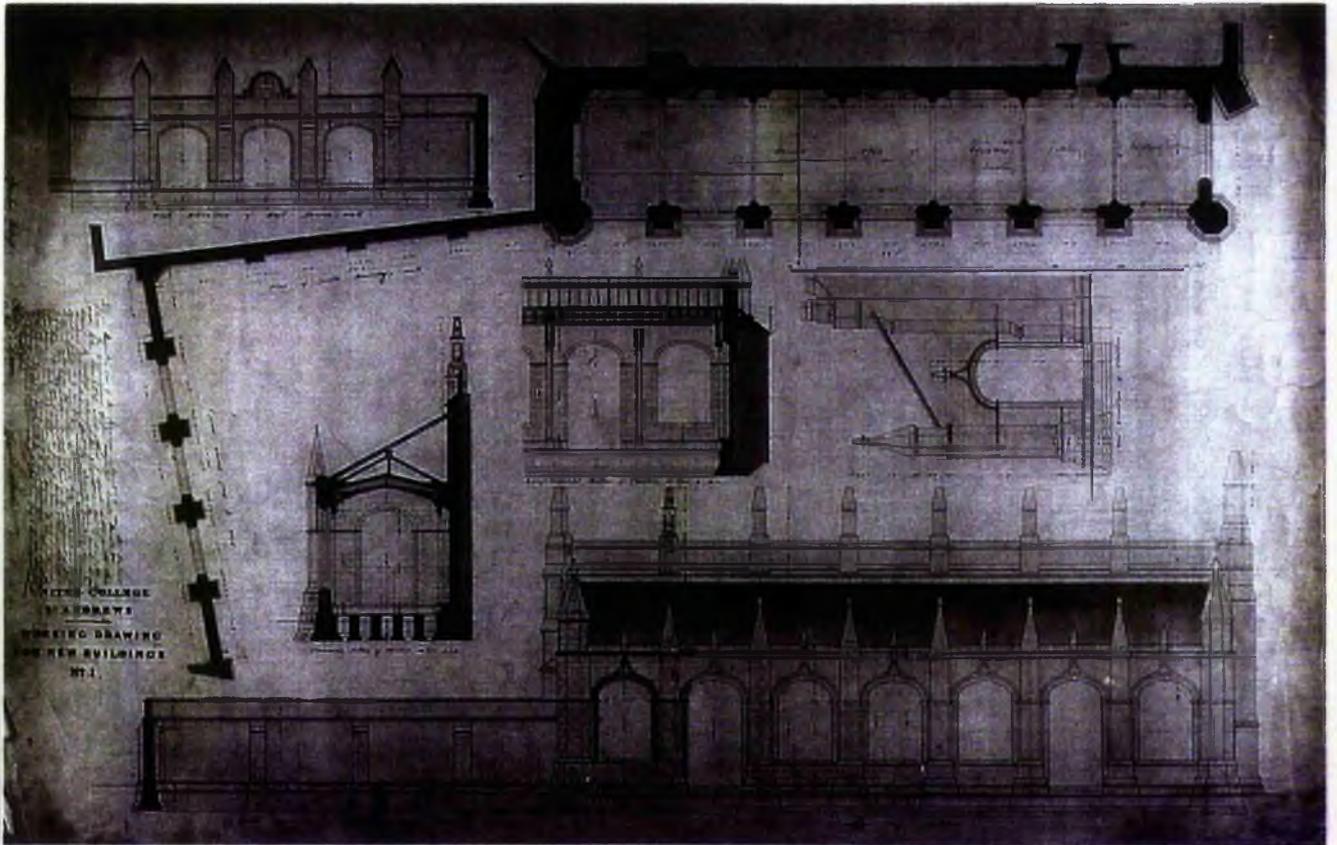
United College. Plan, elevation and section of cloister and screen walls, working drawing No.1. W. Nixon, July, 1847.
